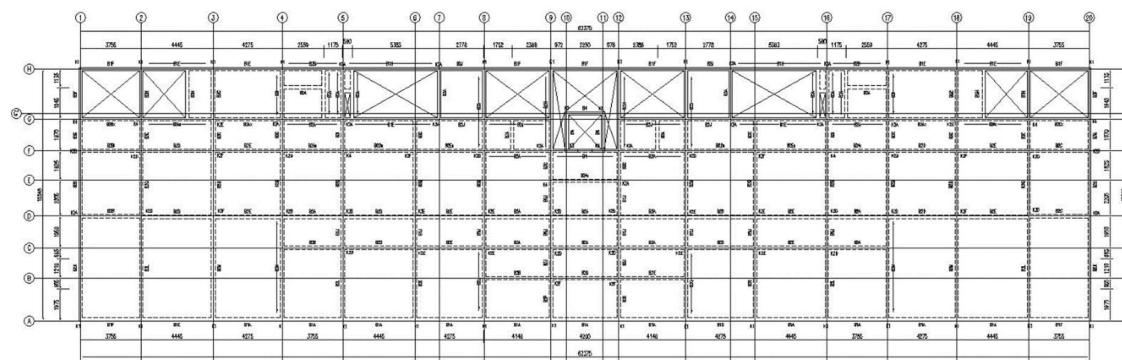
Typical Floor Plan (1st floor – 3rd floor)
